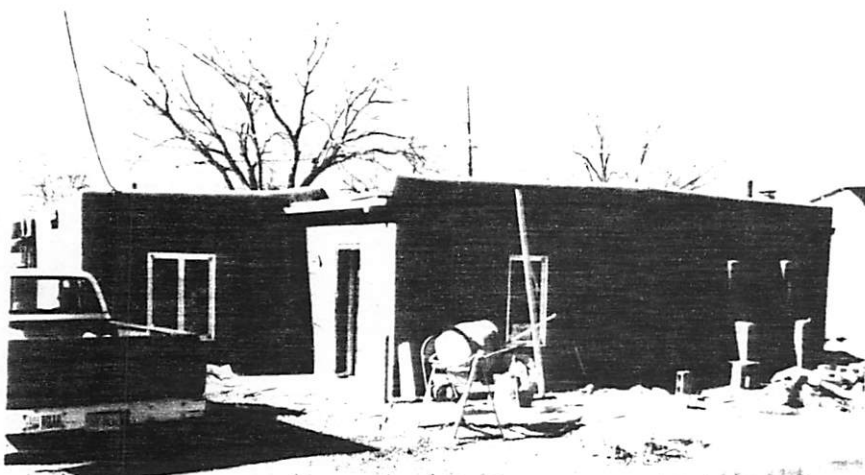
West elevation, including former garage and residence. Camera facing northeast.
